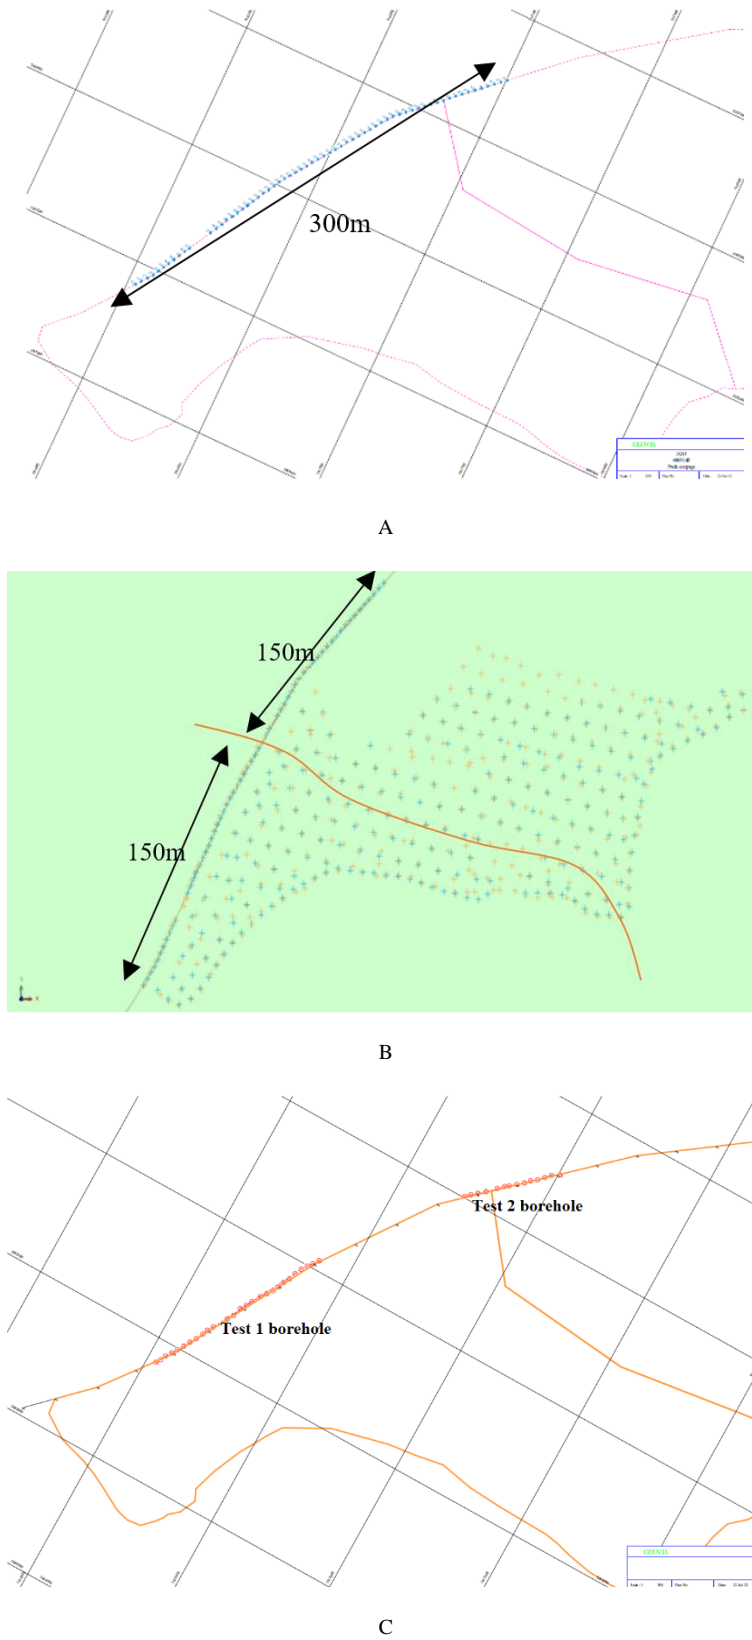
Drilled row scheme on the pit wall side: (A) platform 300m long, (B) divided platform according to the tests, (C) Test boreholes
